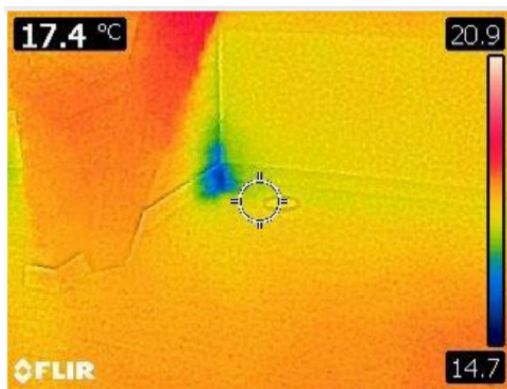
Heat loss at the junction of stud walls and floor in the 1st floor room-in-roof – Image © OAMK
